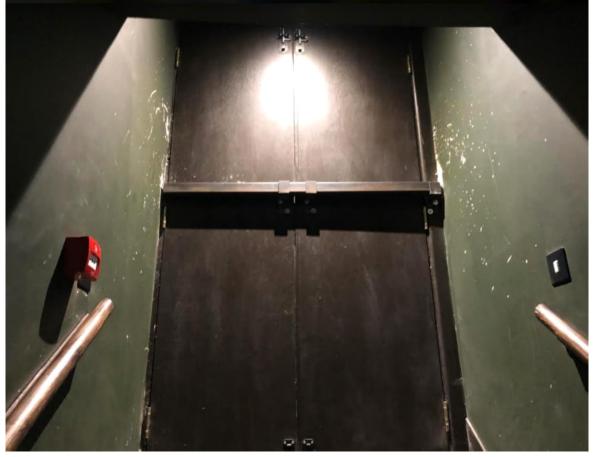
50hrs – 2nd August 2020. Side fire exit from basement floor of Mahiki to Southmill Street. Locked, bolted top and bottom and secured with a steel bar.
